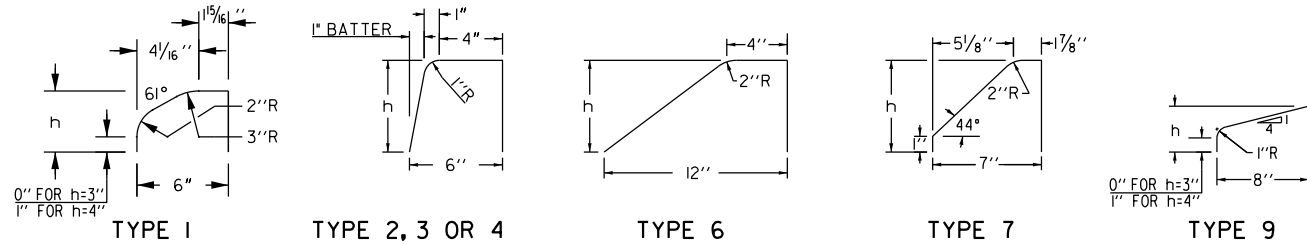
DETAILS OF RECESSED CURB FOR DRIVEWAYS
